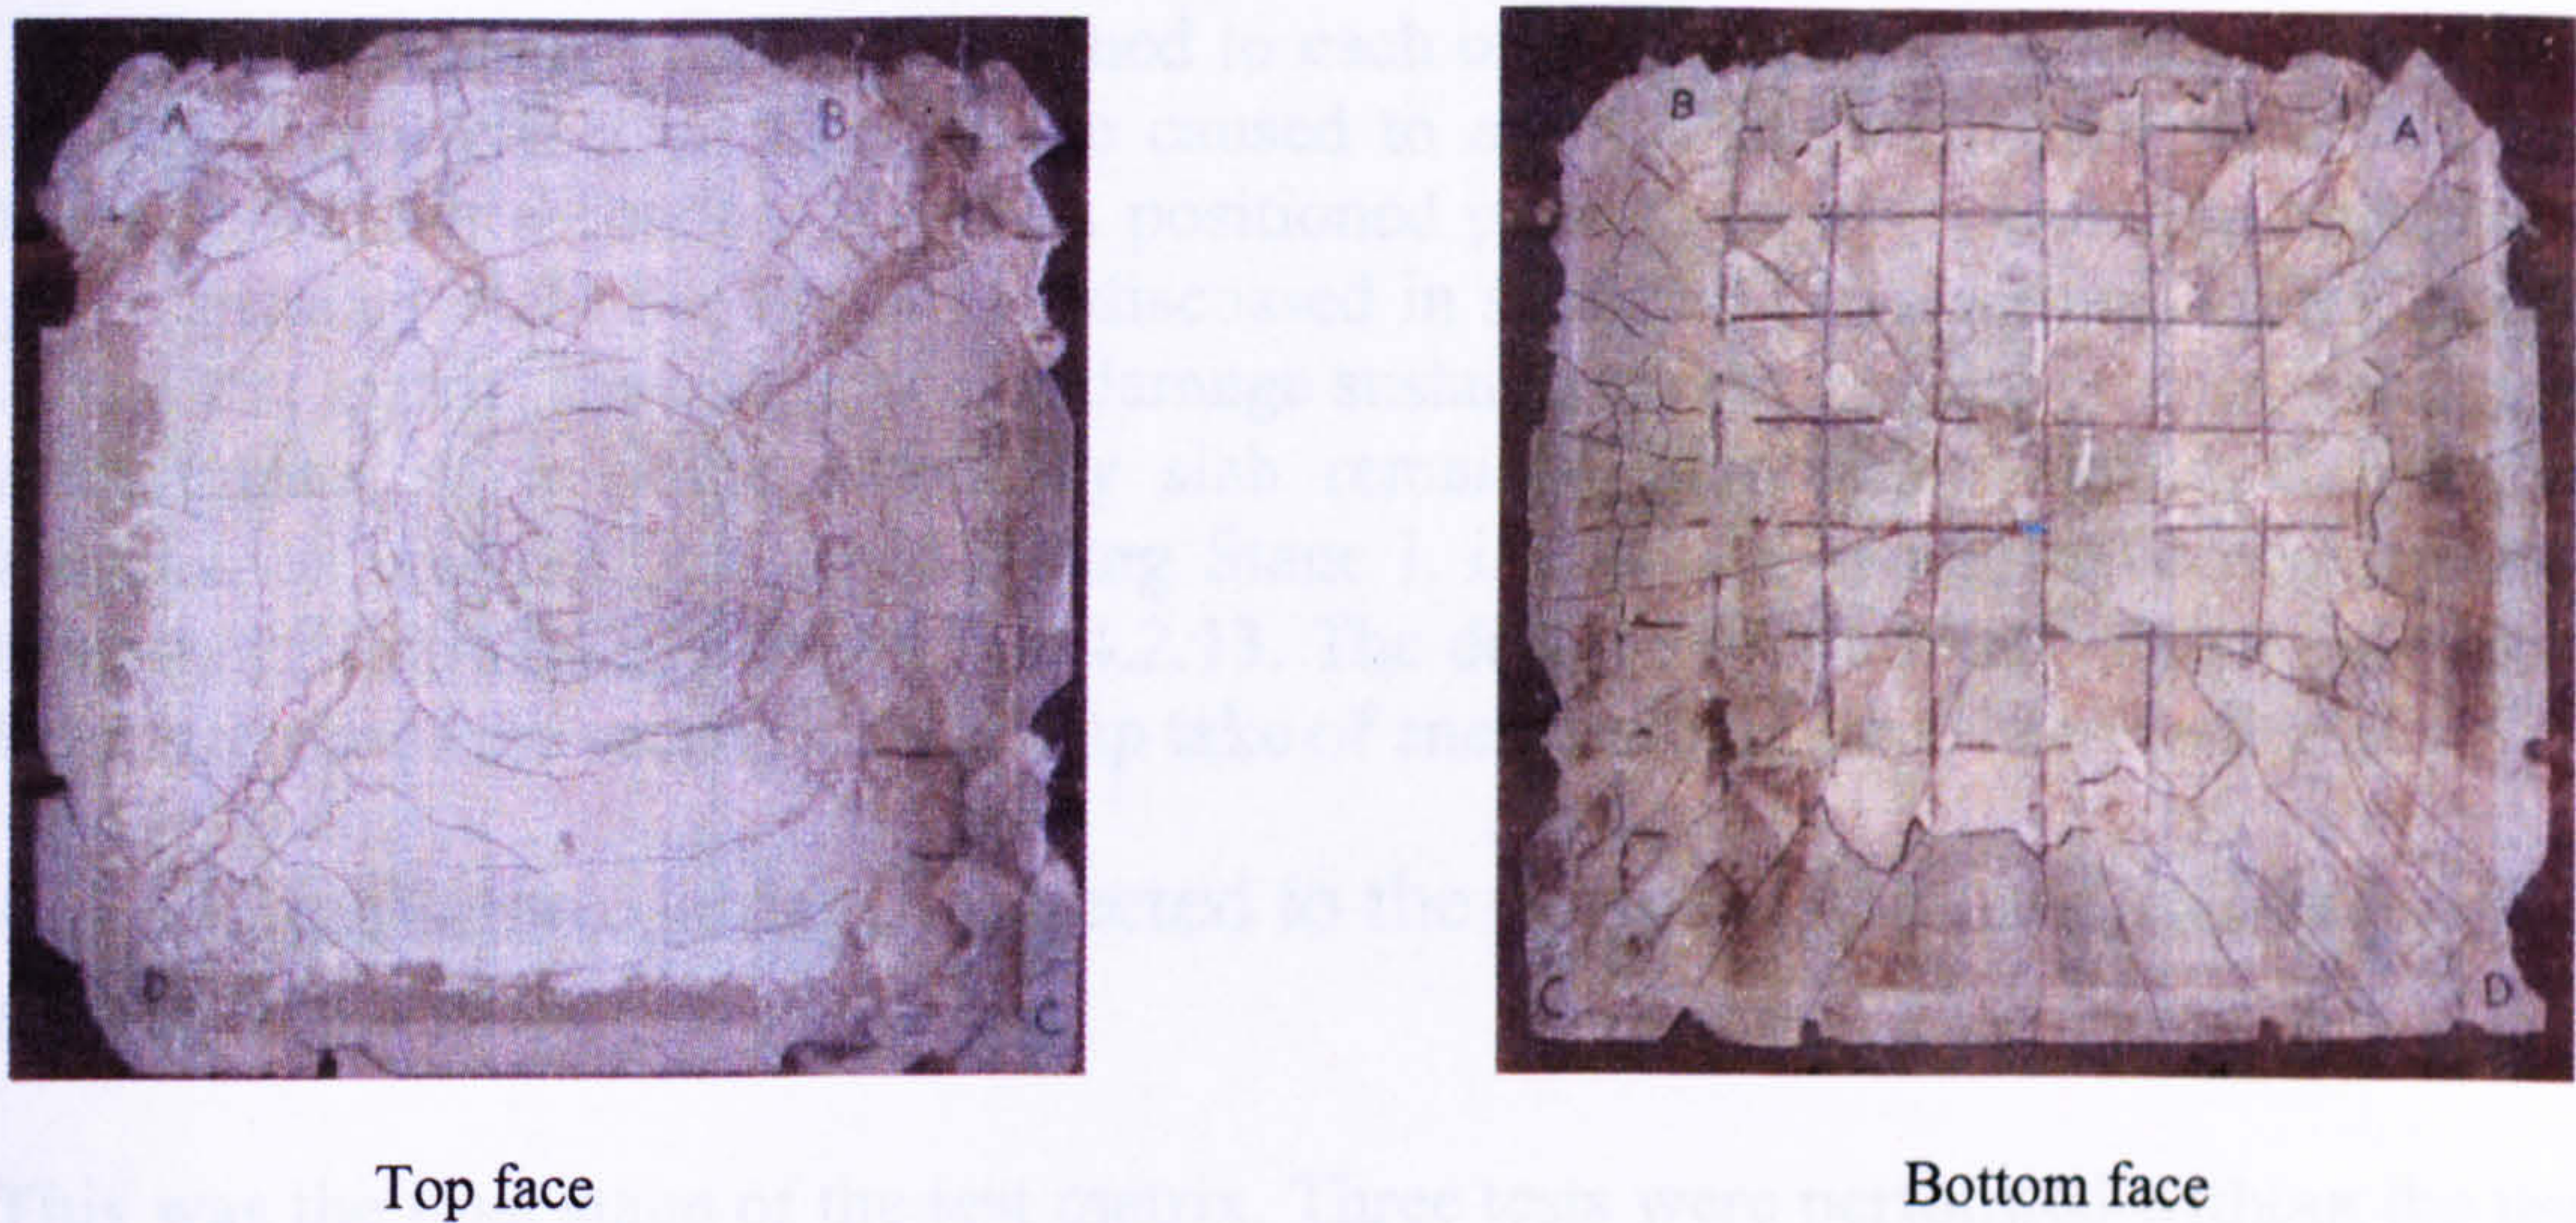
Top and bottom faces of primary slab RCR73IT12-13.
